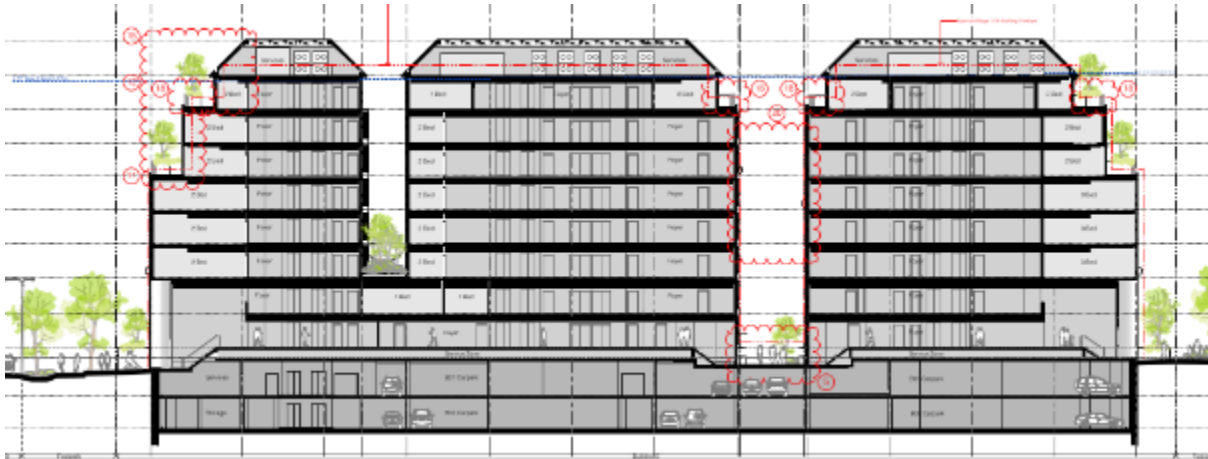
Proposed Section A through development (Macdonald Street to Metters Street)
